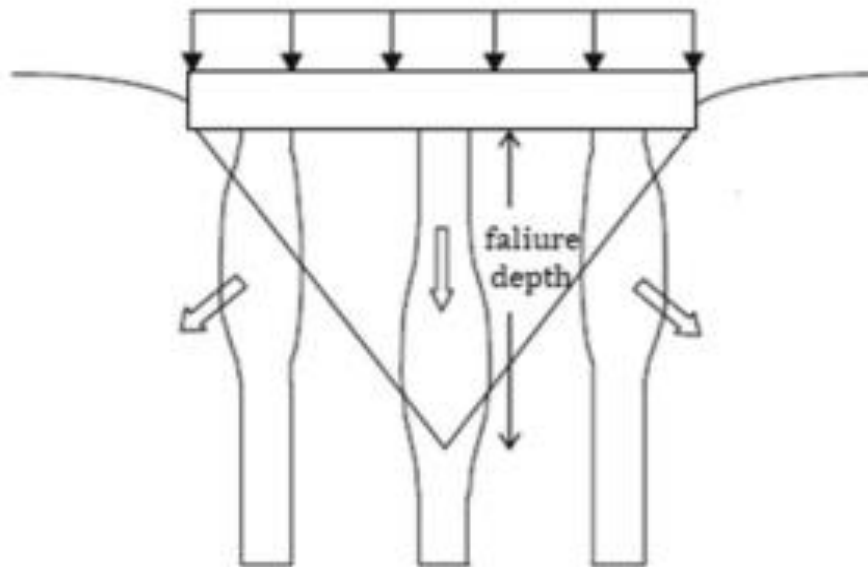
Failure mechanism of grouped stone column (Wood D.M. et al, 2000)
